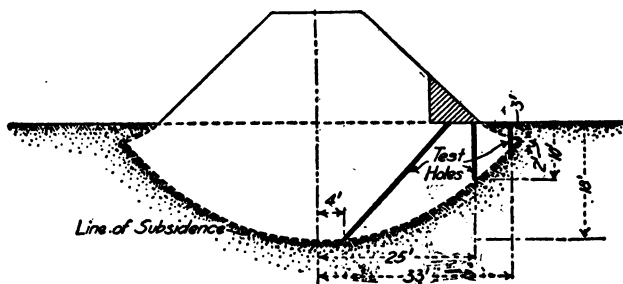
Typical Arrangement and Depths of Drill Holes.
